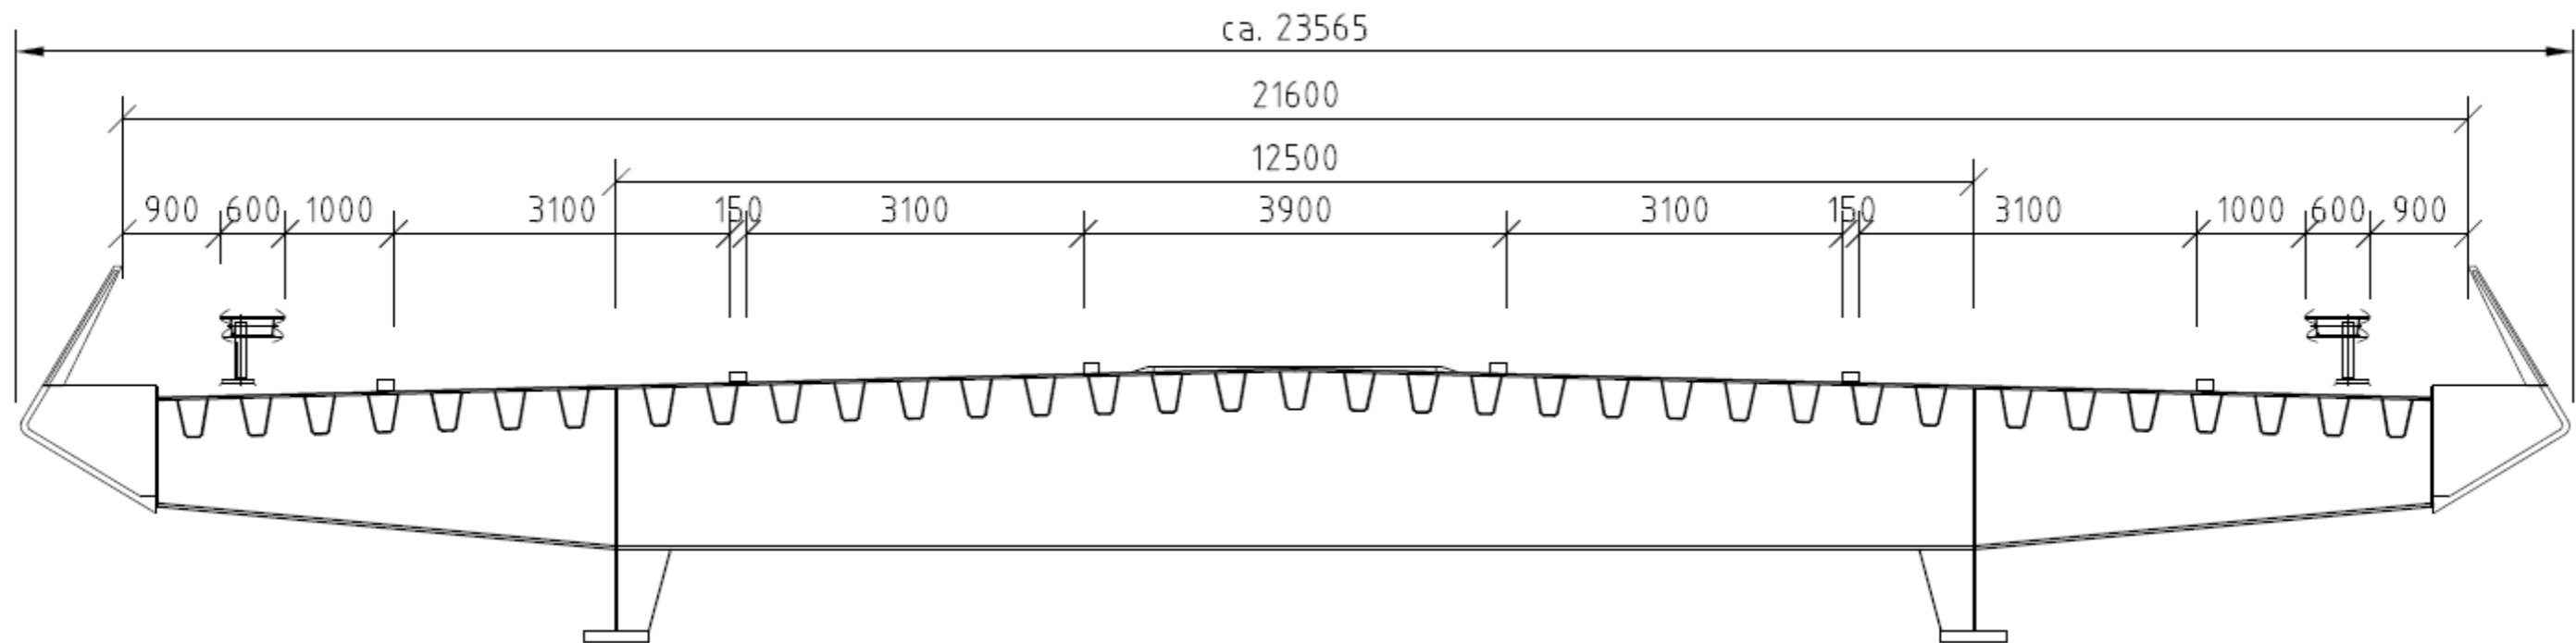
Cross section original Amalia bridge (Heijmans, 2015)
